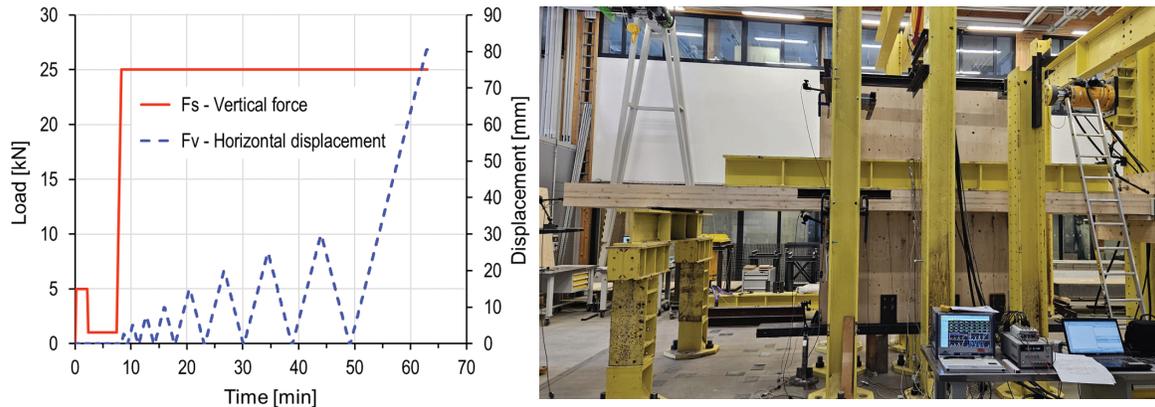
Loading diagram of the shear wall test (left), test specimen under loading during the experiment (right).
